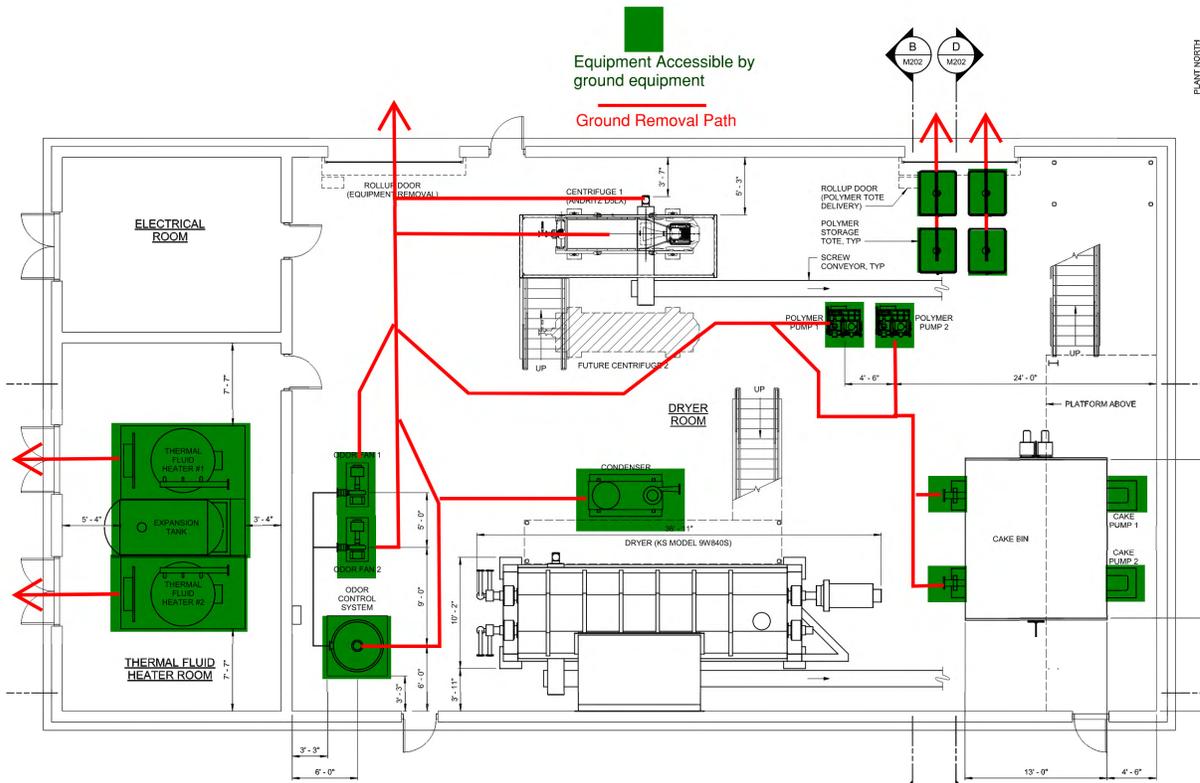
Floor Level Equipment Removal for Thermal Dryer Facility
